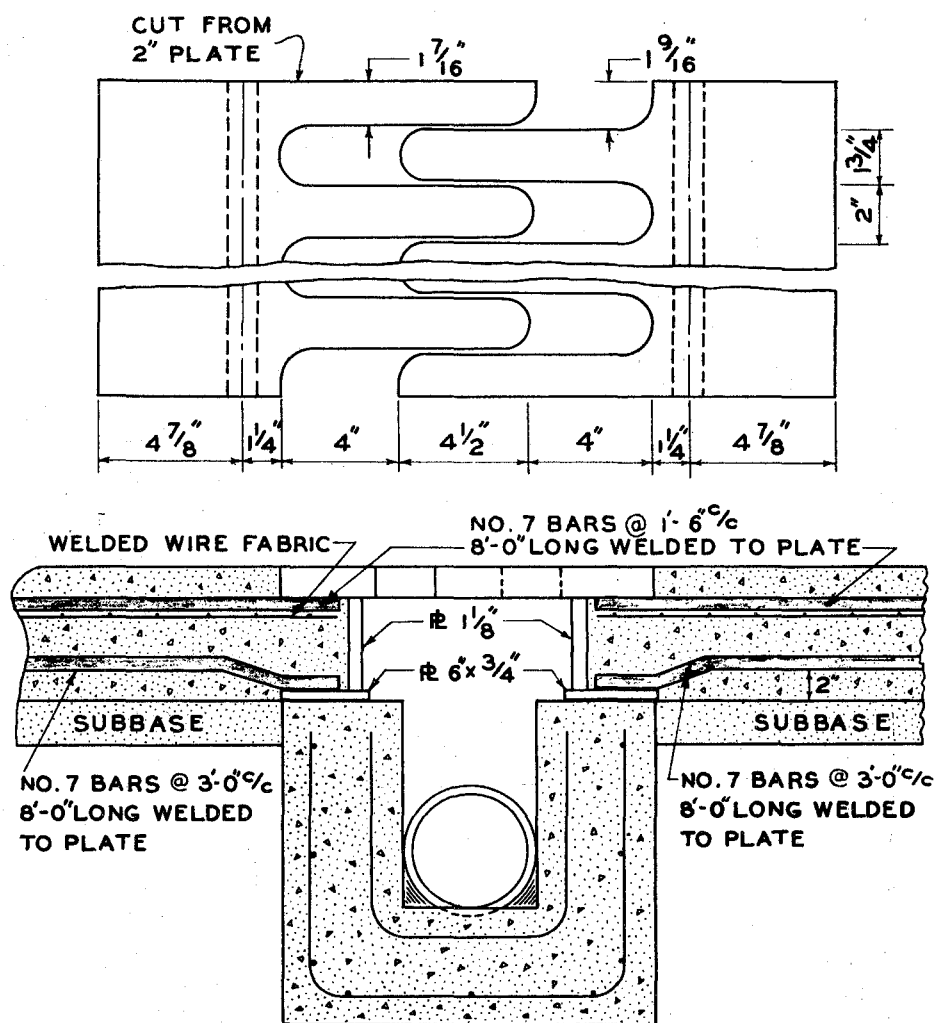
FINGER TYPE BRIDGE TERMINAL JOINT
